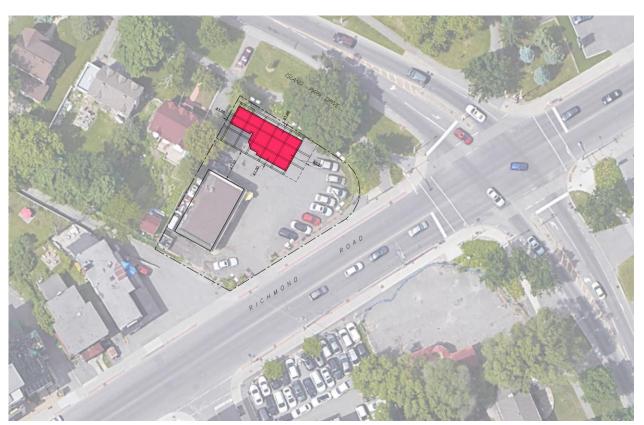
Temporary building storage location for the Service Station has ben negotiated and will be stored directly across the road.
